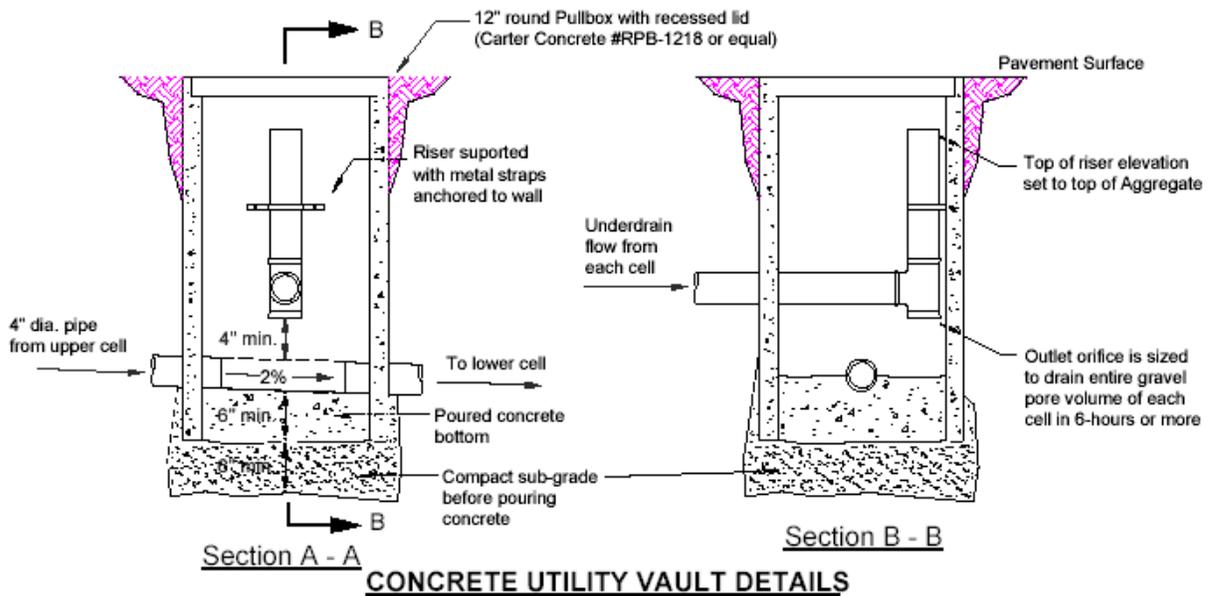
Layout for Underdrain System for Porous Pavement Installations (Modified from UDFCD 2005)
